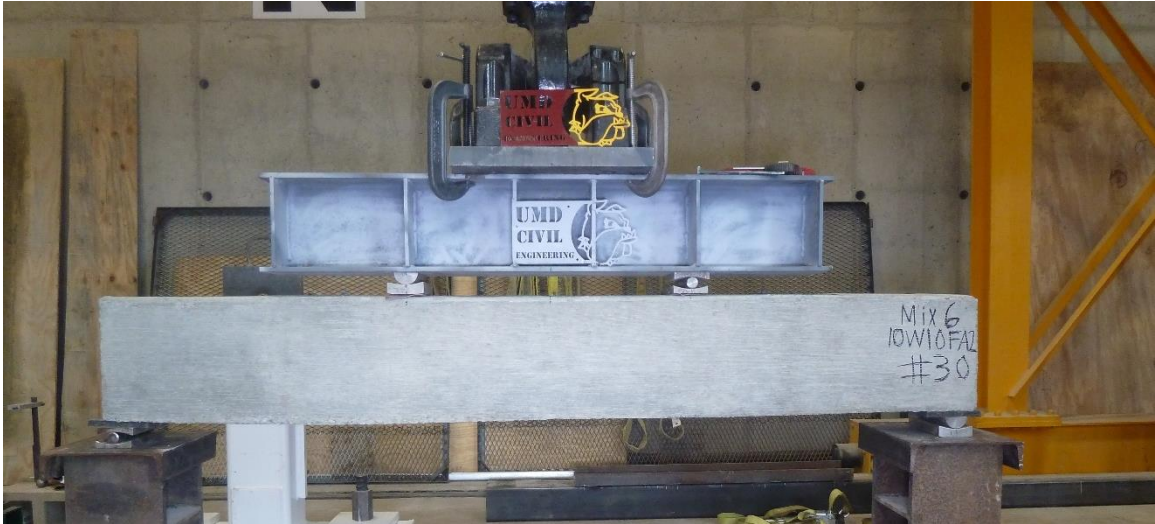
Mixture 6 (10W10FA2) beam #30: concrete beam before testing.
